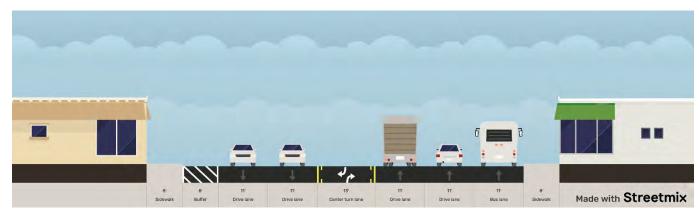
Grand Avenue Typical Section 2: 27th Street to 23rd Street
